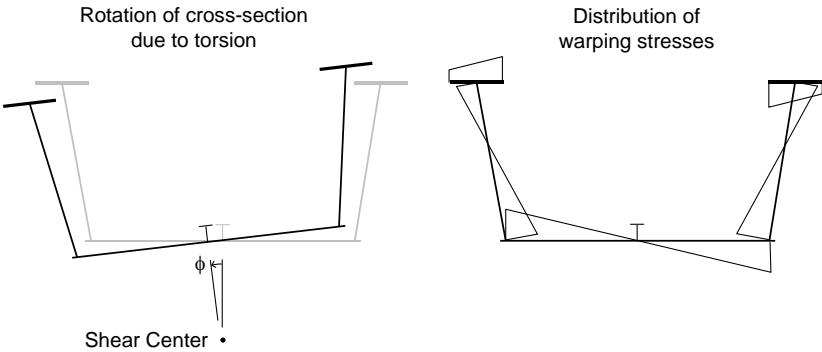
Shear center location and predominant torsional deformations for a tub girder section that does not have a top-flange bracing system.
